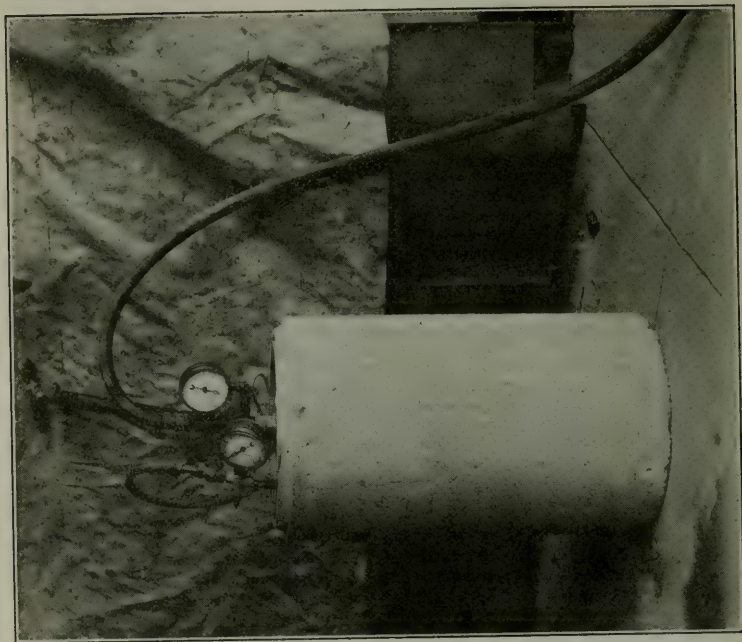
PLATE VIII. B. Concrete Pipe Testing Apparatus in Place.
